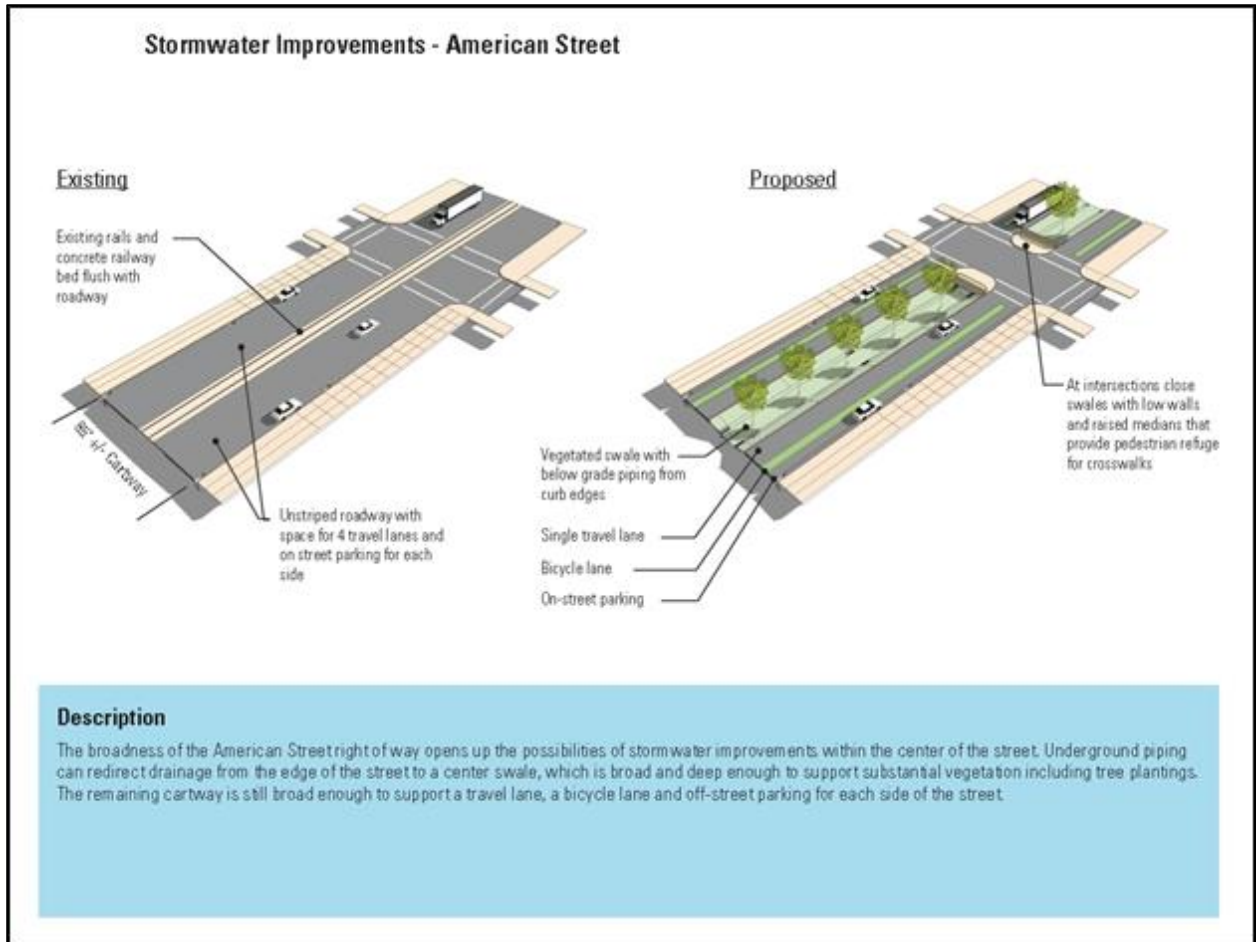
Adapting American Street – On-site Stormwater Retention
